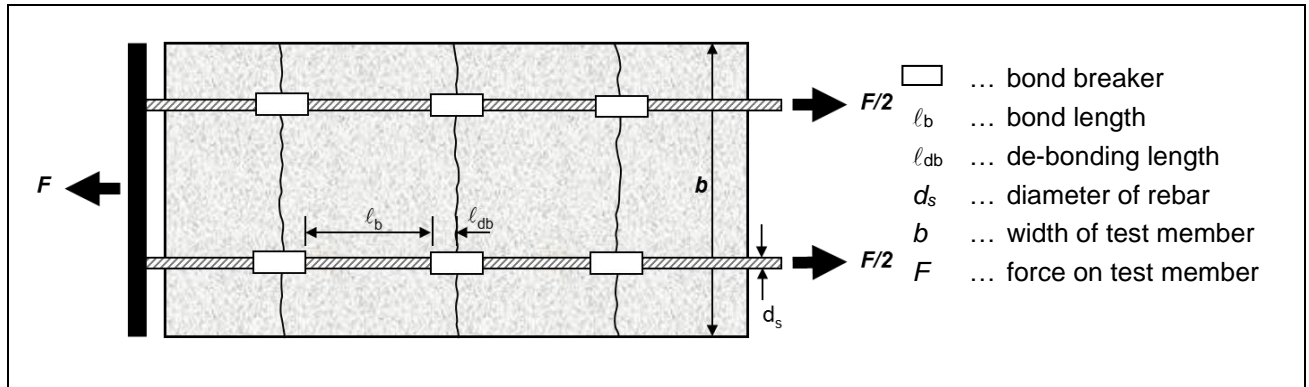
Example for test member with bond breaking pipes on rebar (plan view)
